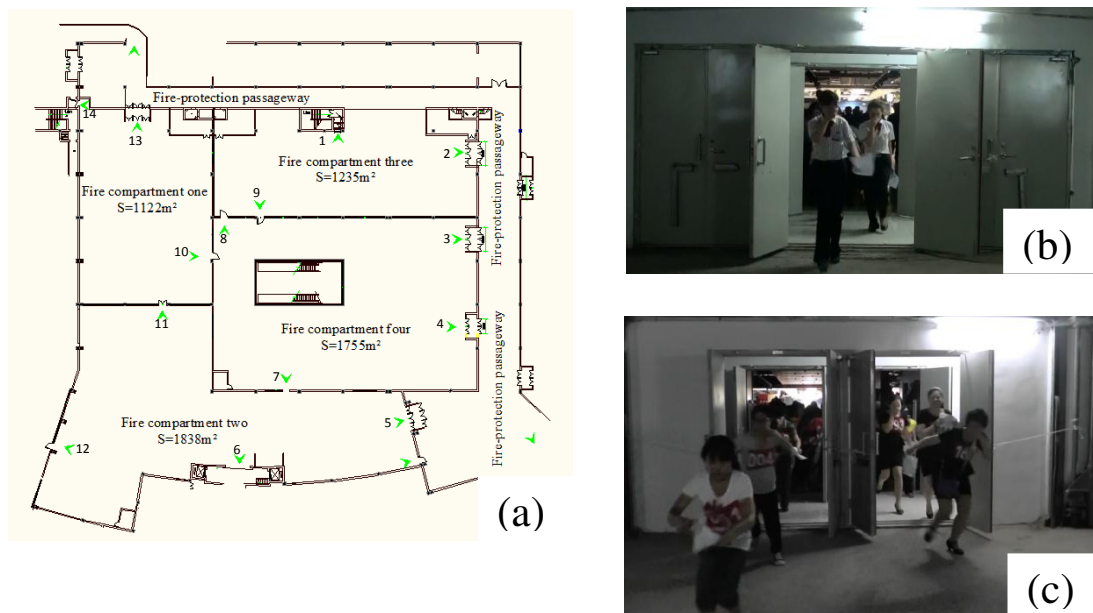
Schematic of the underground floor of the retail store(a); Snapshots of the evacuation processes from cameras on (b)exit 3 and (c)exit 4.
